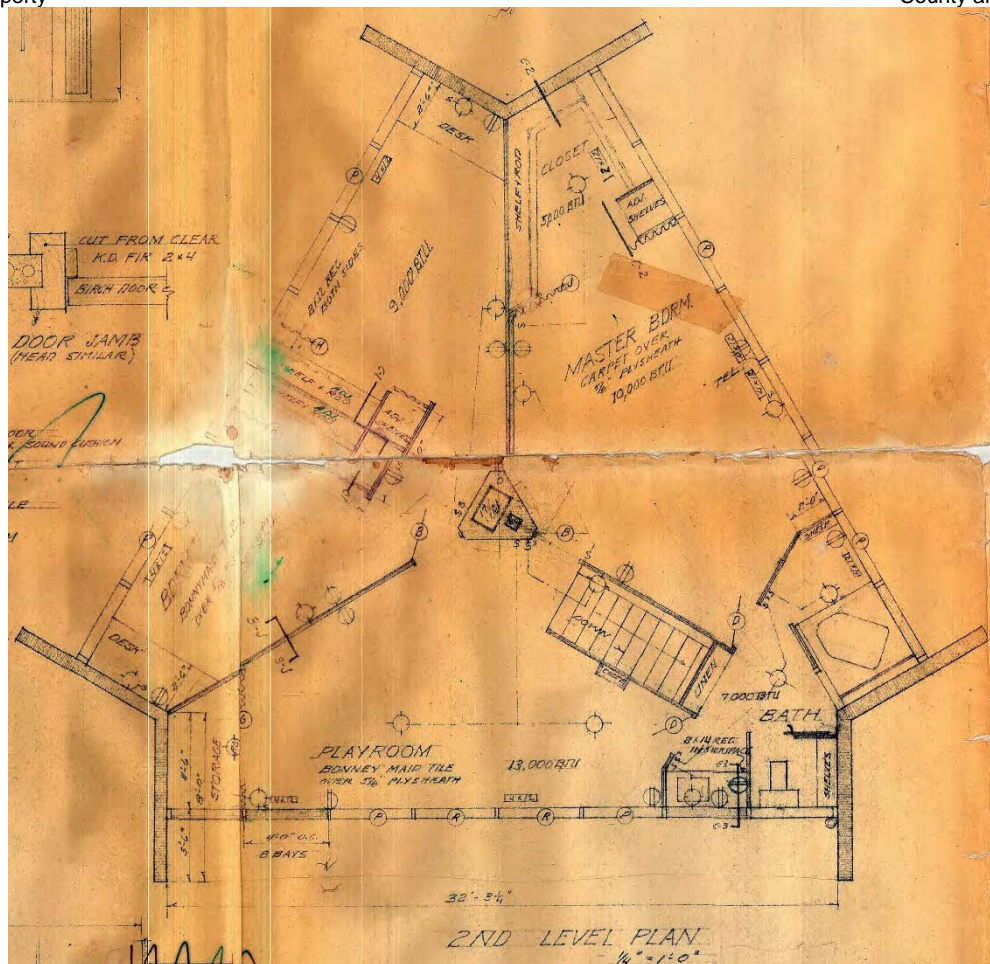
Second floor interior floorplan, depicting master bedroom, secondary bedrooms, living space and bath.³⁴
